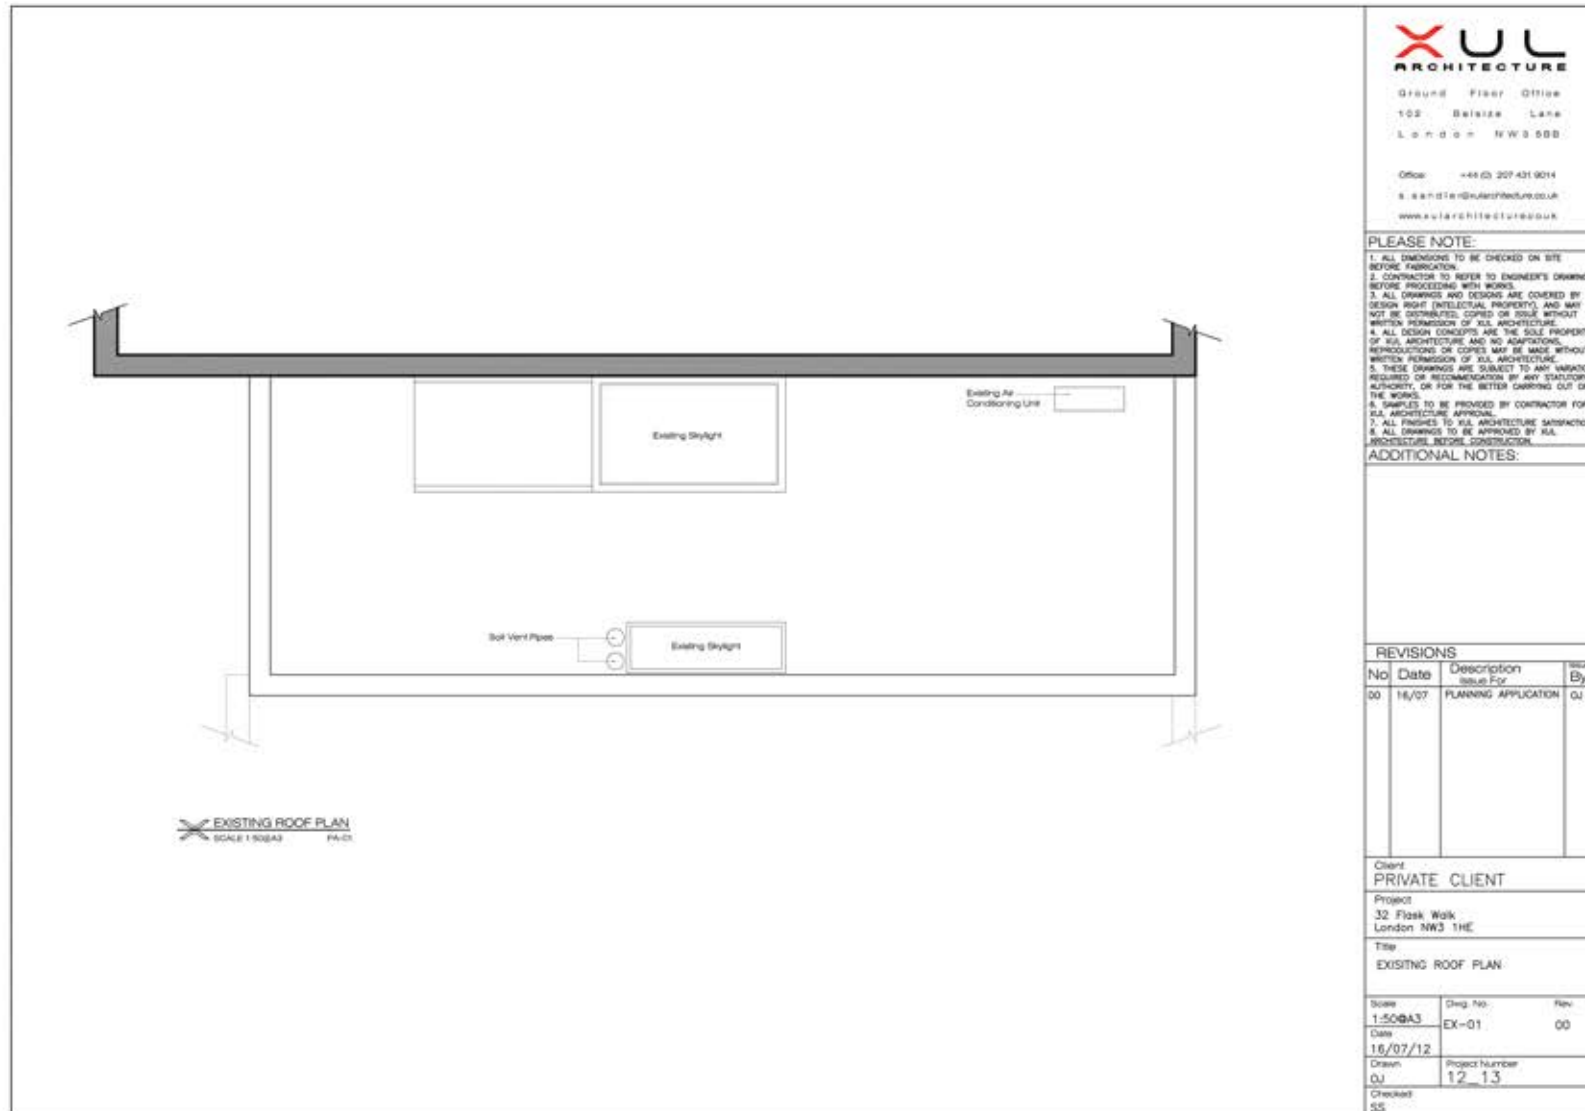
Plans showing Air conditioning unit at 32 Flask Walk
